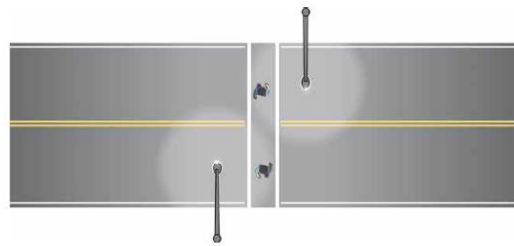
Drawing. New design for midblock crosswalk lighting layout.
